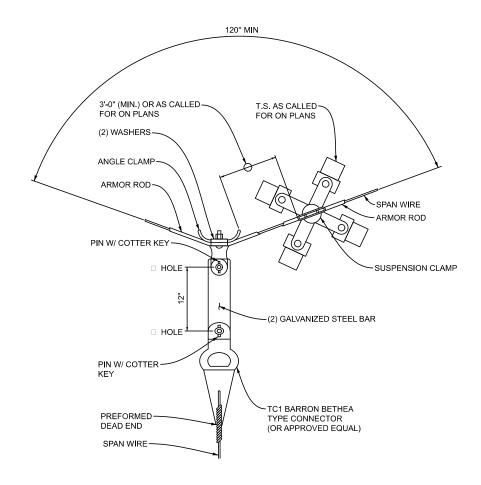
## DETAIL SPAN HANGER ASSEMBLY (ALTERNATE)
